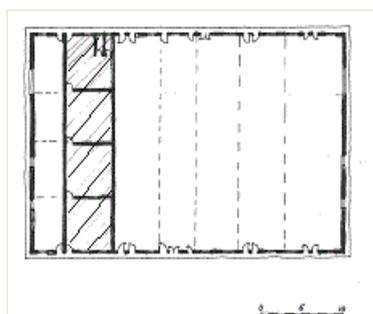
General plan of a Deep strip house. The shaded part is that area which belongs to a single household (see enlargement of this area in figure 4.20).
